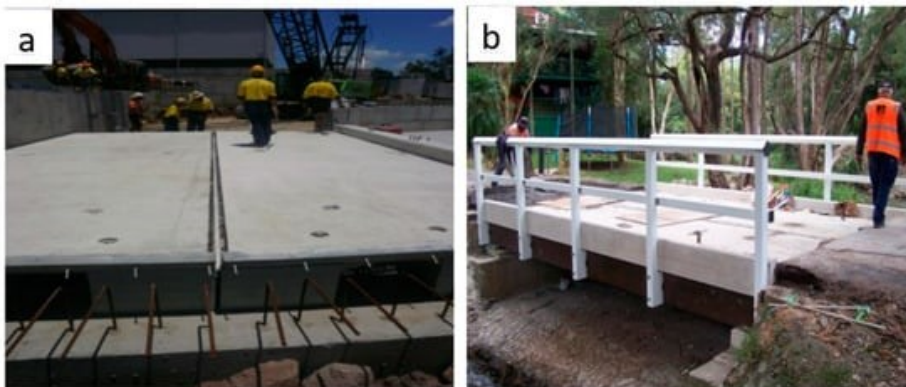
(a) The Murrarie Plane site bridge and (b) the Bundaleer Road bridge
